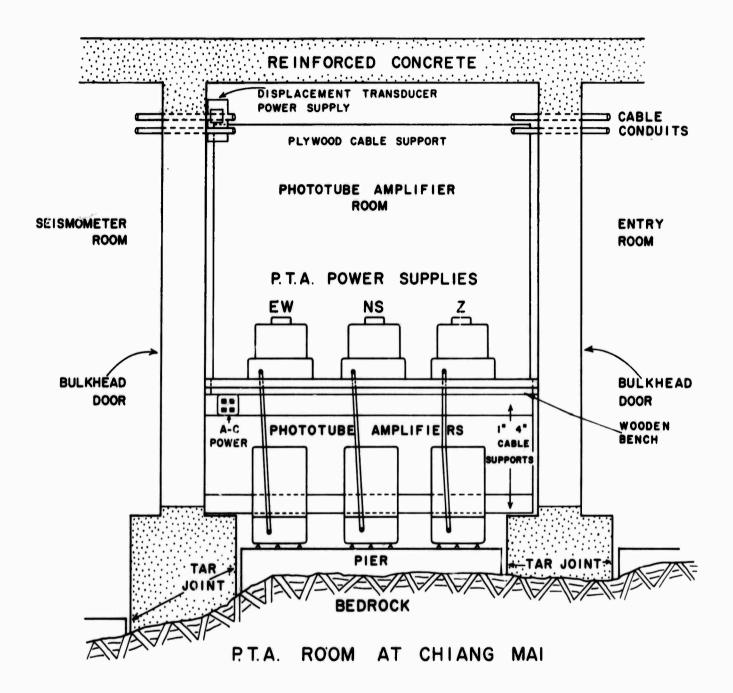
Cross-sectional view of Phototube Amplifier Room.
